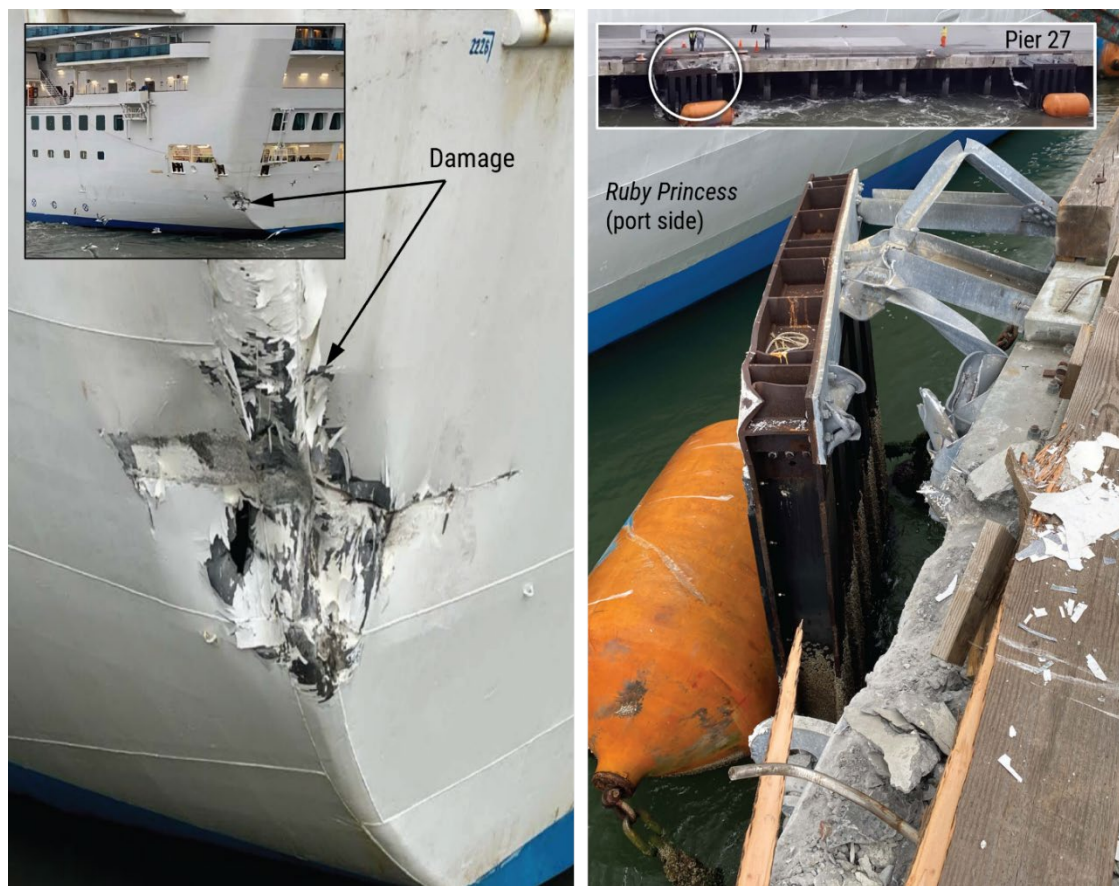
Left to right: *Ruby Princess* damage and Pier 27 damage (circled in inset) on July 6, 2023. (Source: US Coast Guard (left); Coast Guard and KRON4 (inset) (right))
